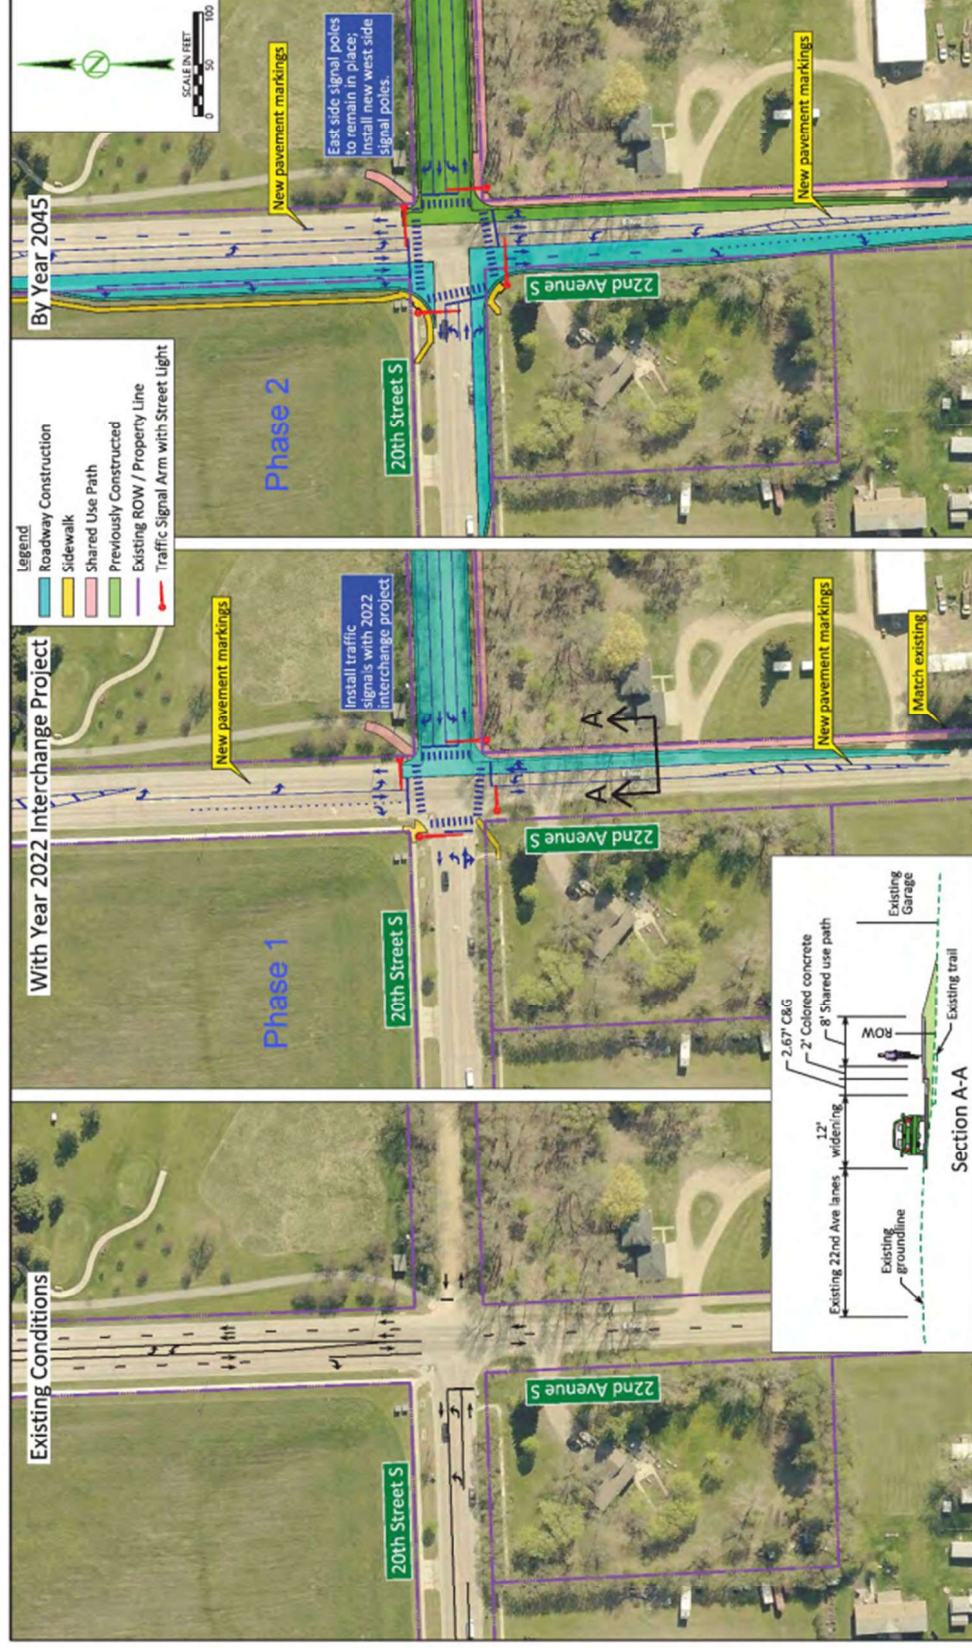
Proposed Improvements Discussed in the 2020 EA to the Intersection of 20th Street South and 22nd Avenue South
